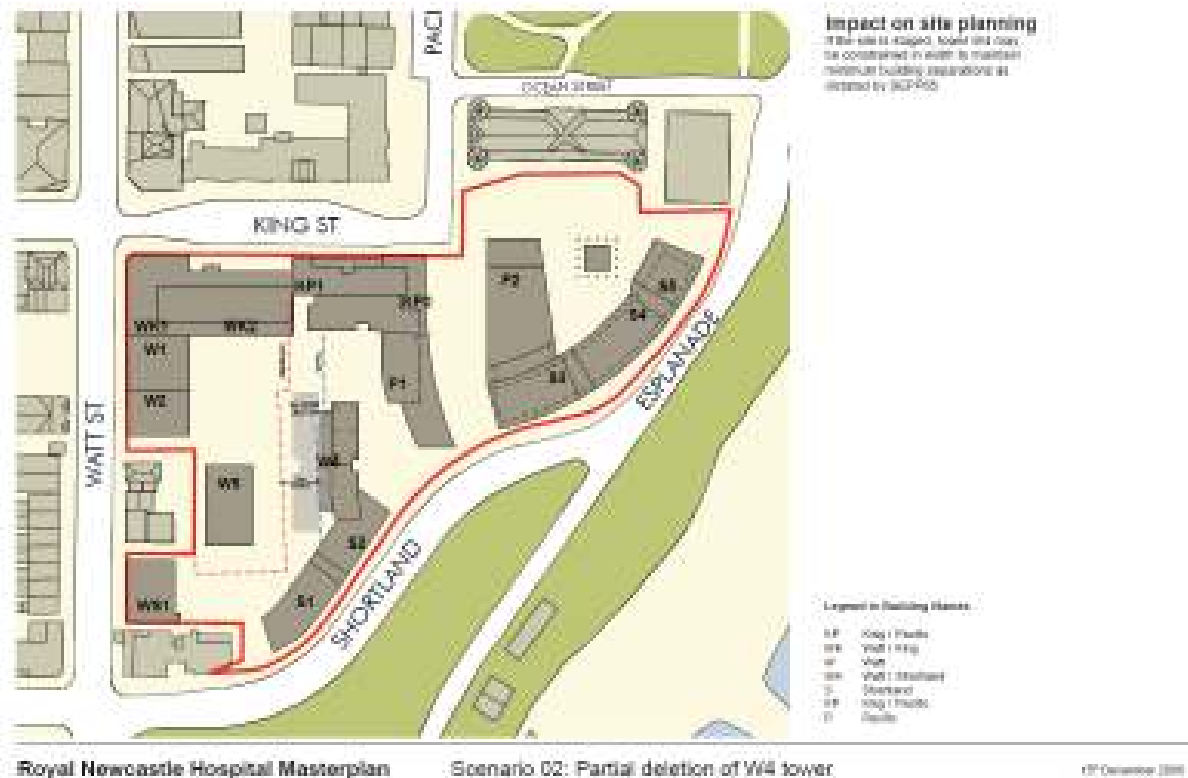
Proposed subdivision impact – Amendment to concept plan Option 2 – Partial deletion of W4 tower
